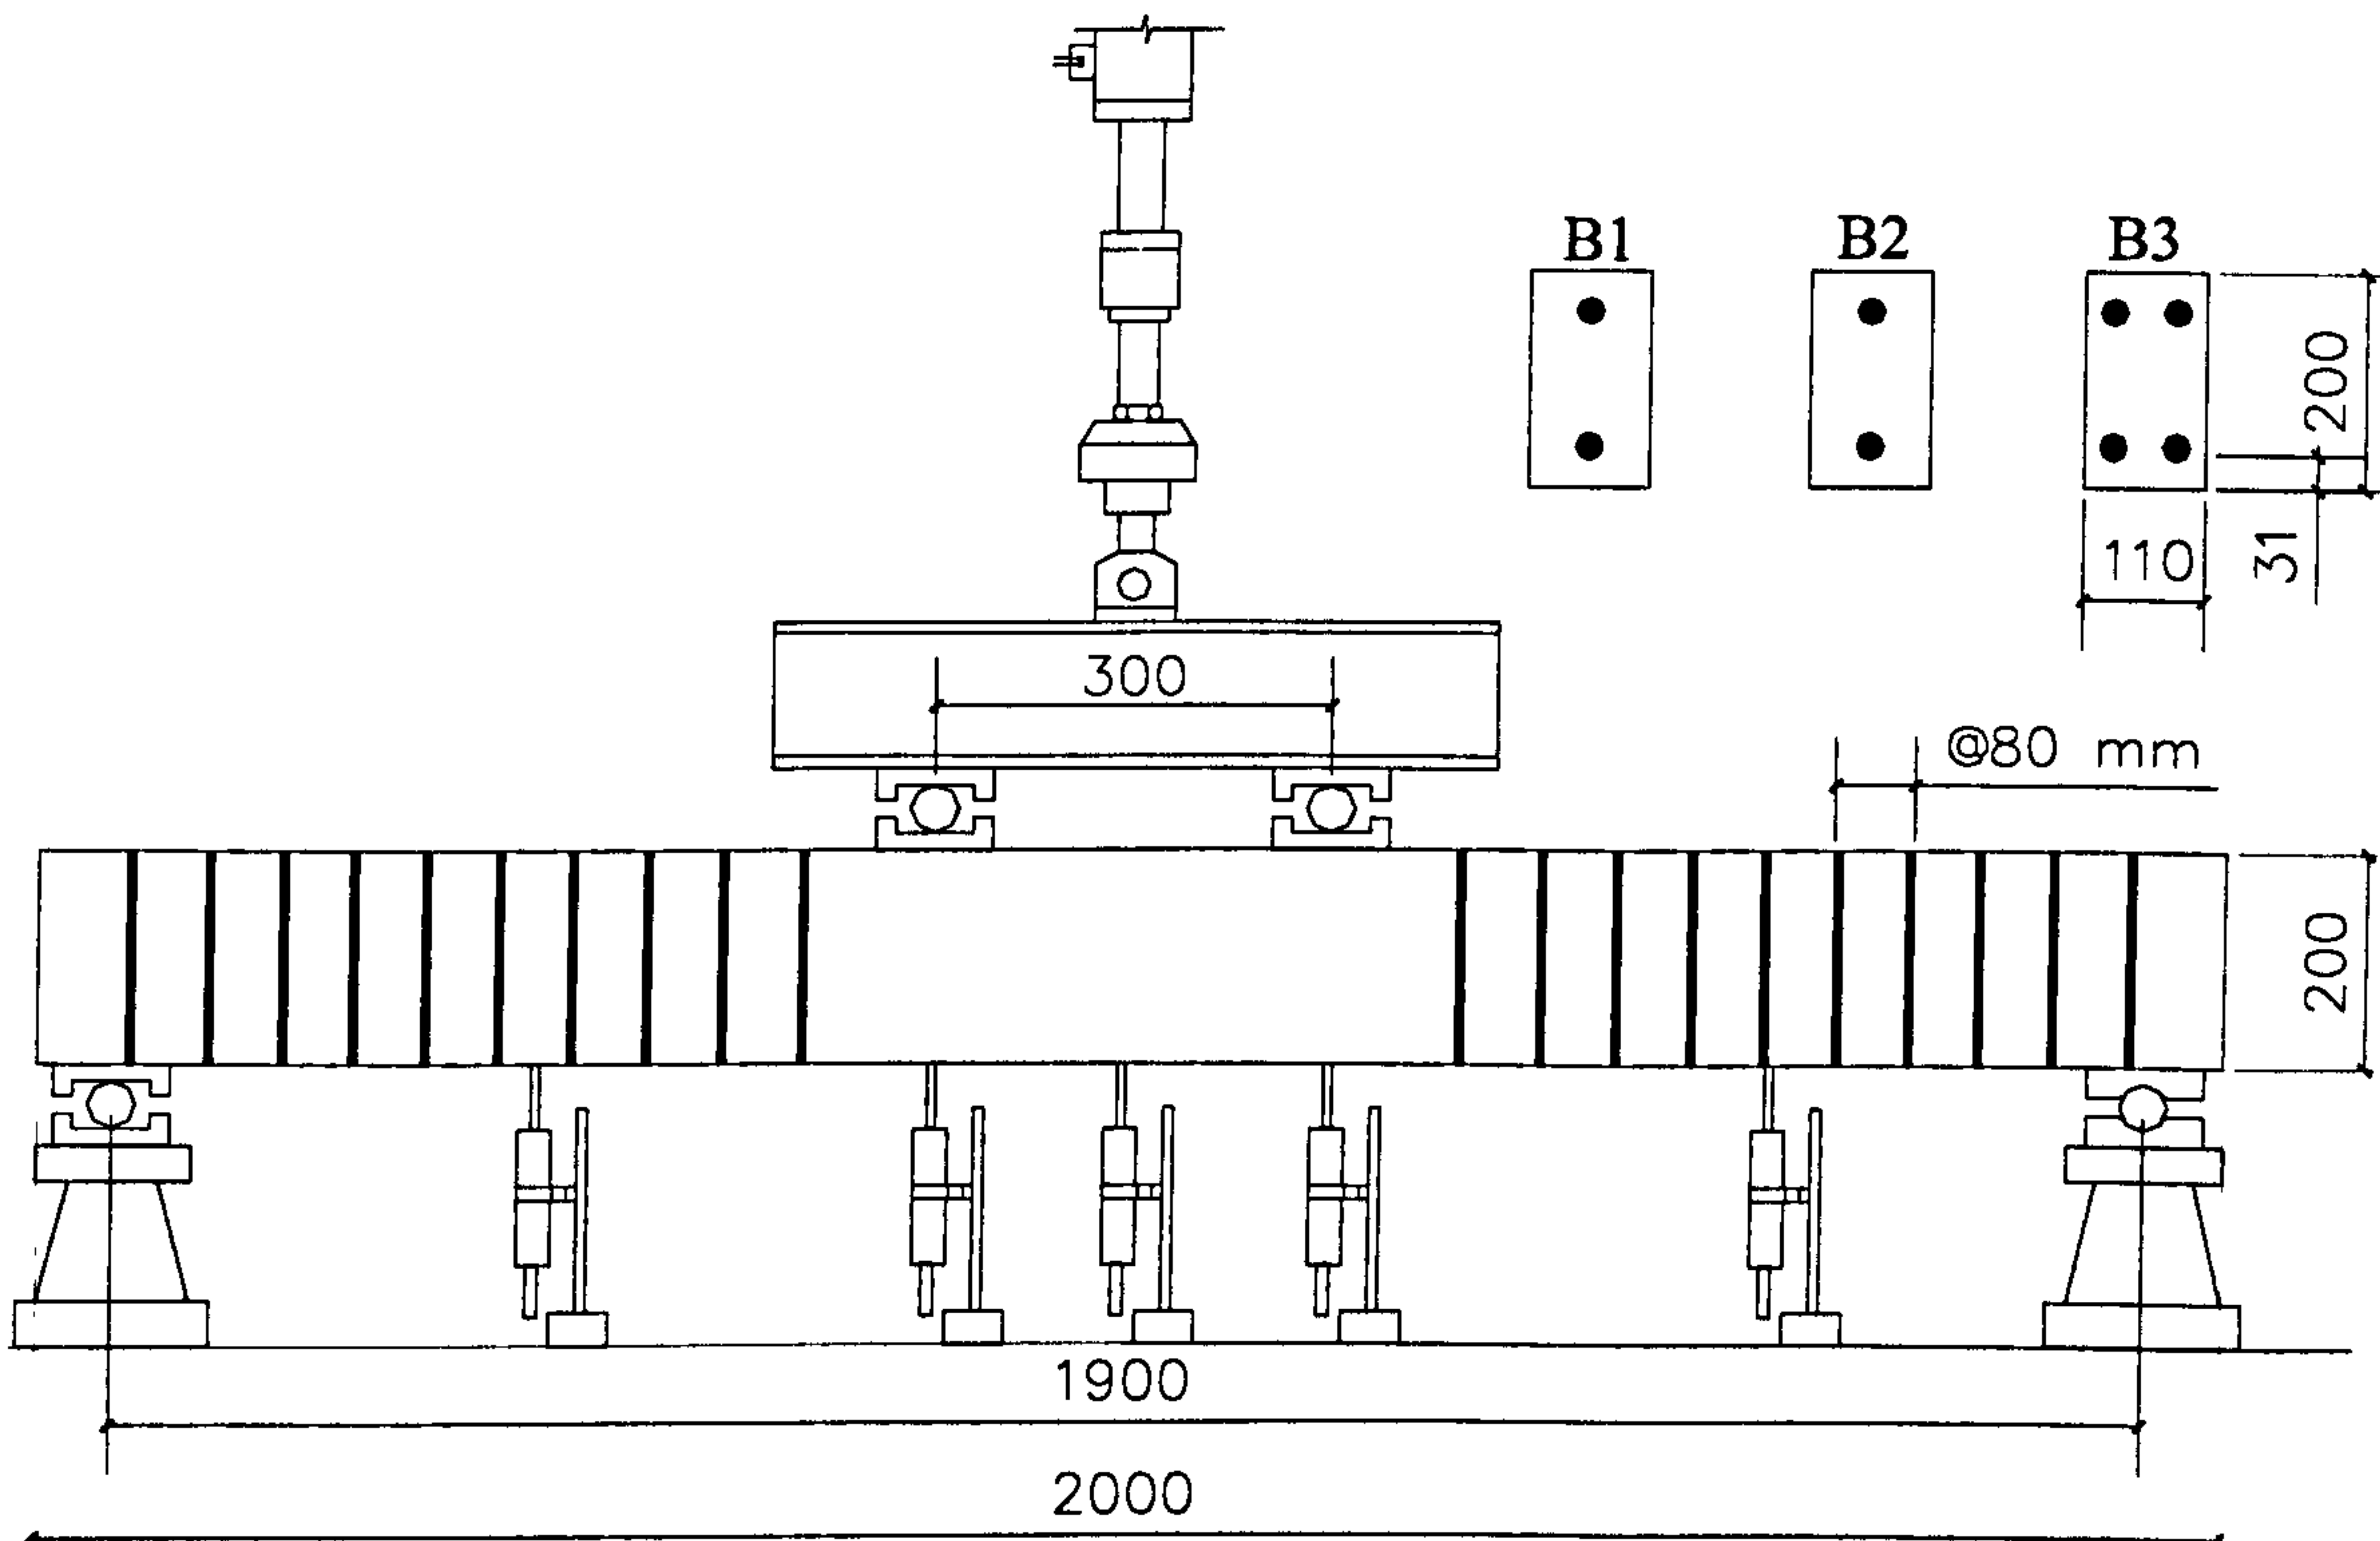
Test set-up and the reinforcement details of the beams B1, B2 and B3
